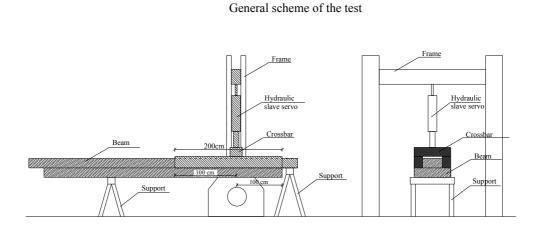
General scheme of the test stand used to provide test on supports of the reinforced concrete beams
